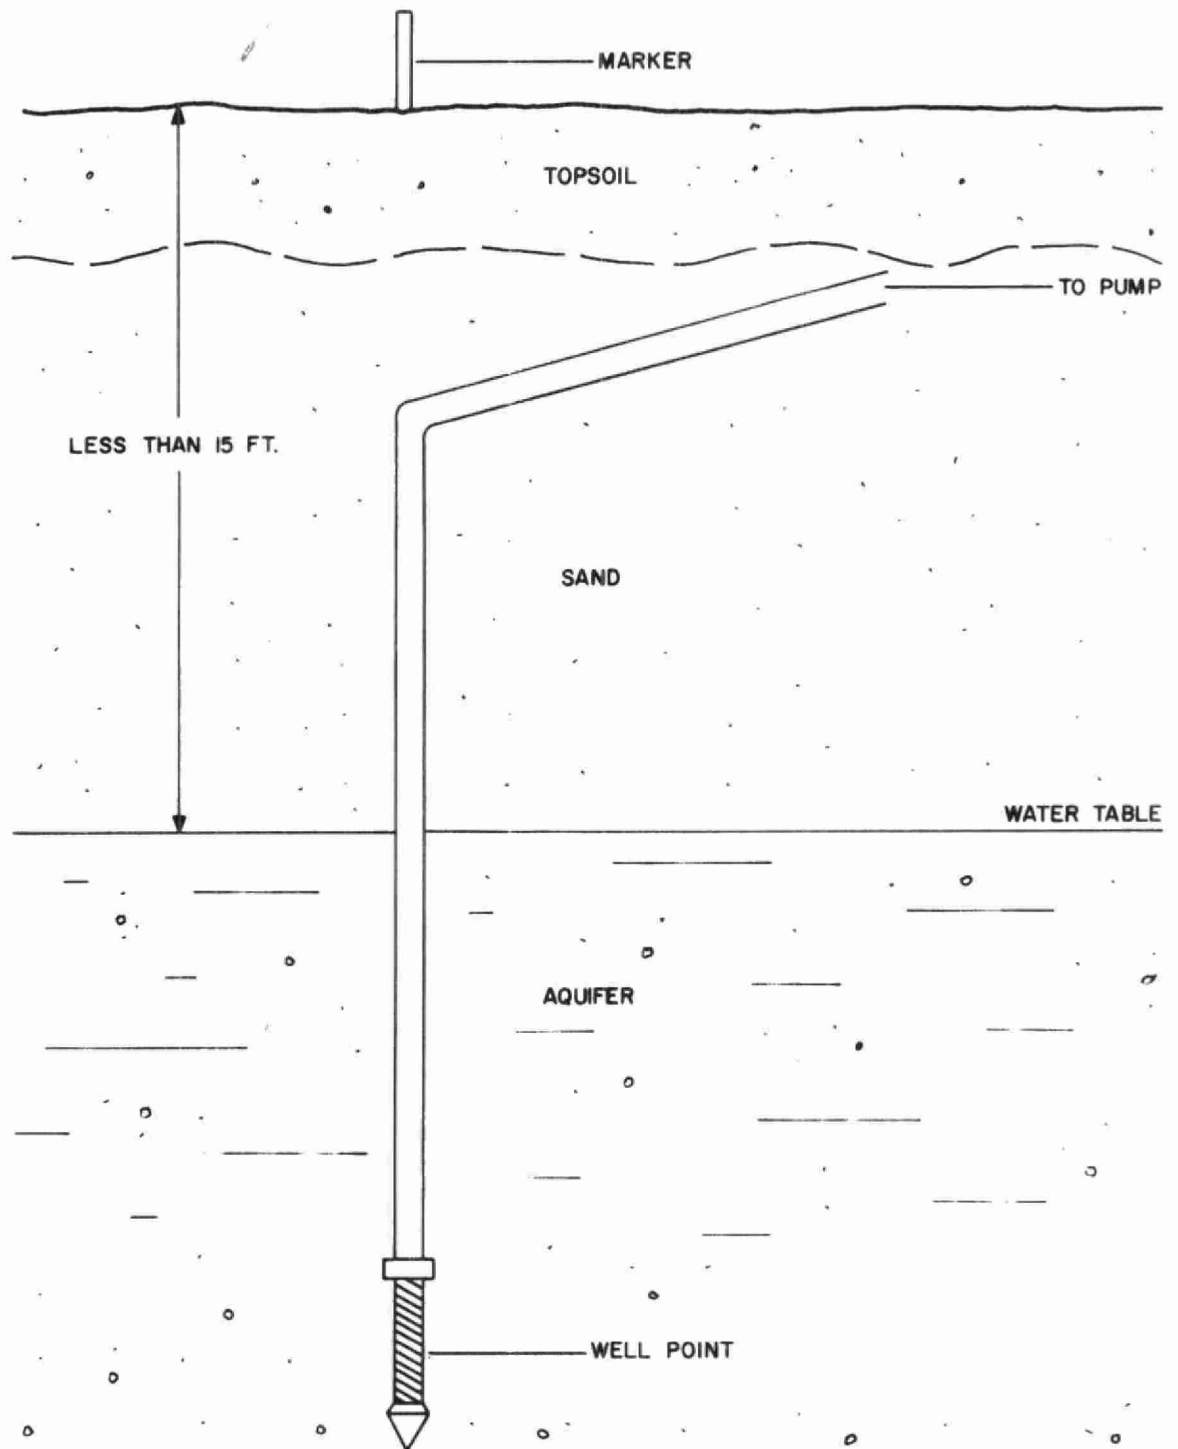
SUGGESTED CONSTRUCTION OF A SAND POINT
